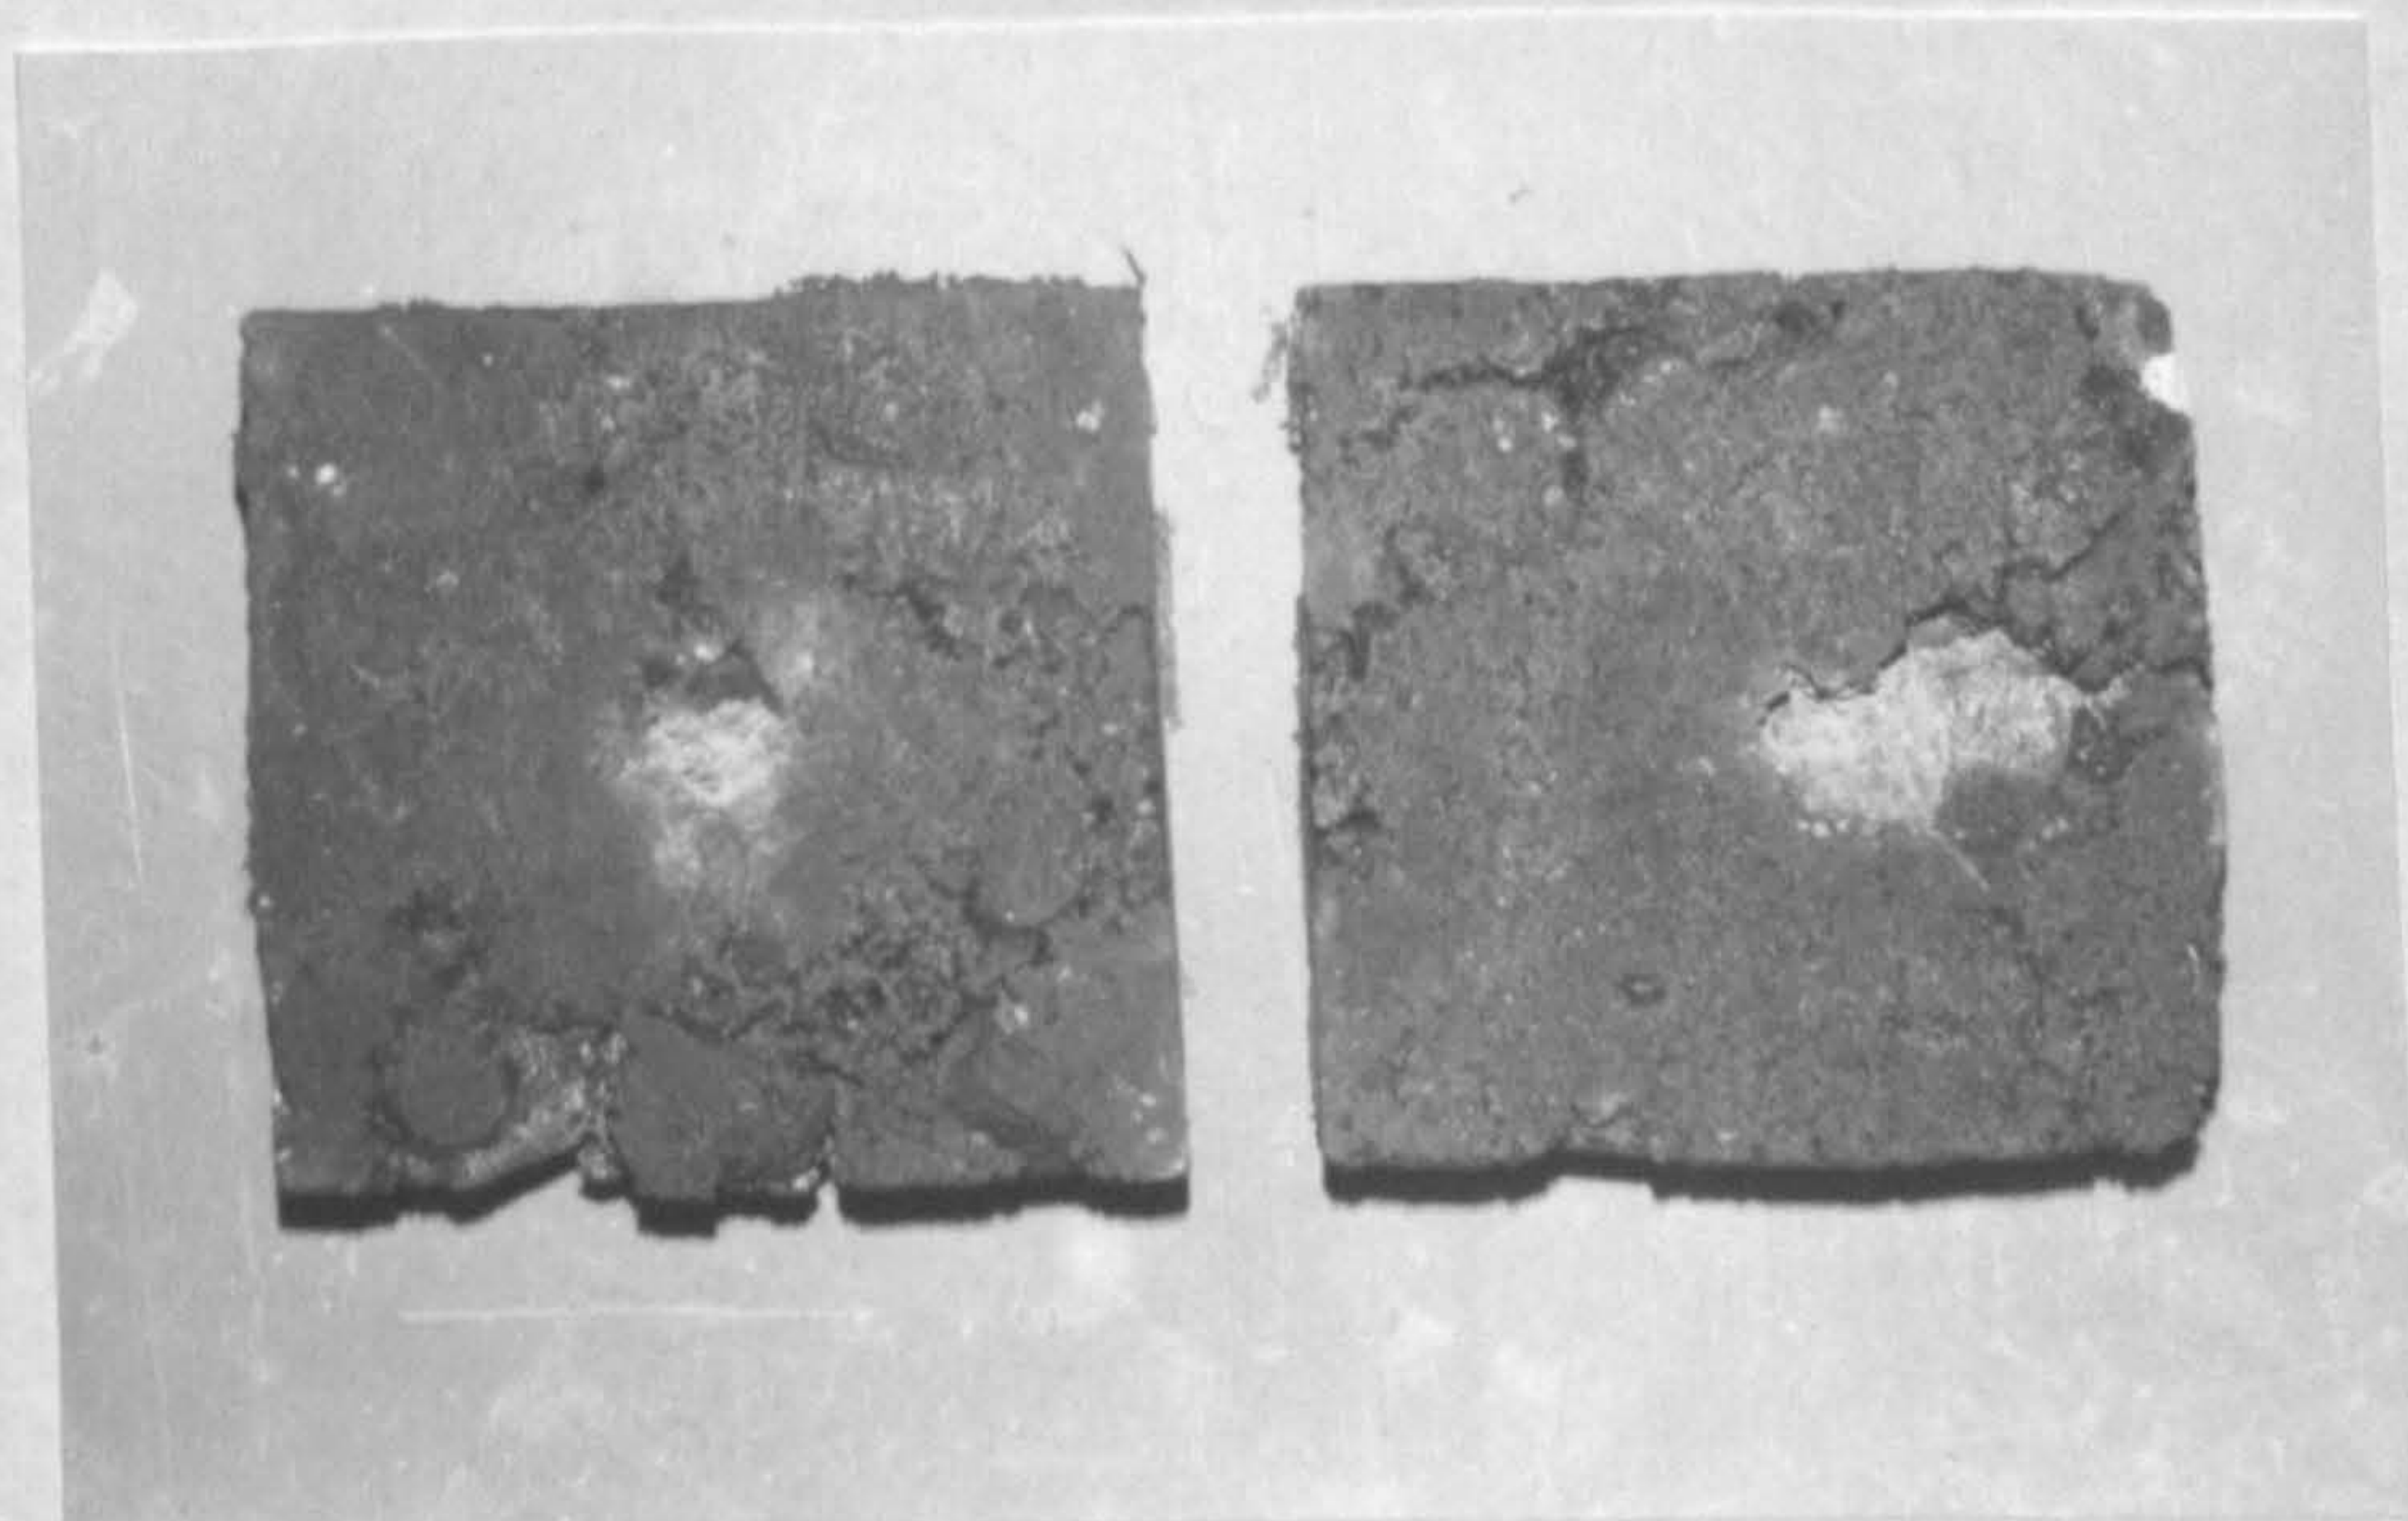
TYPICAL IMPACT FACE DAMAGE, SERIES 16
